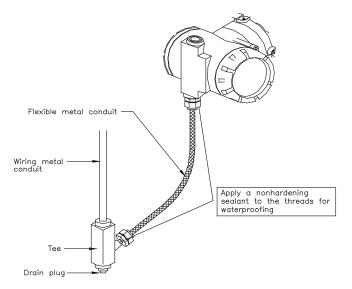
Typical Mounting using Flexible Metal Conduit
